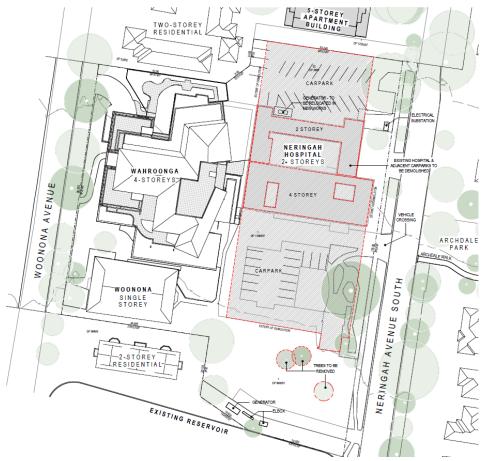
Existing Site Plan. (Source: Bickerton Masters Architecture)
